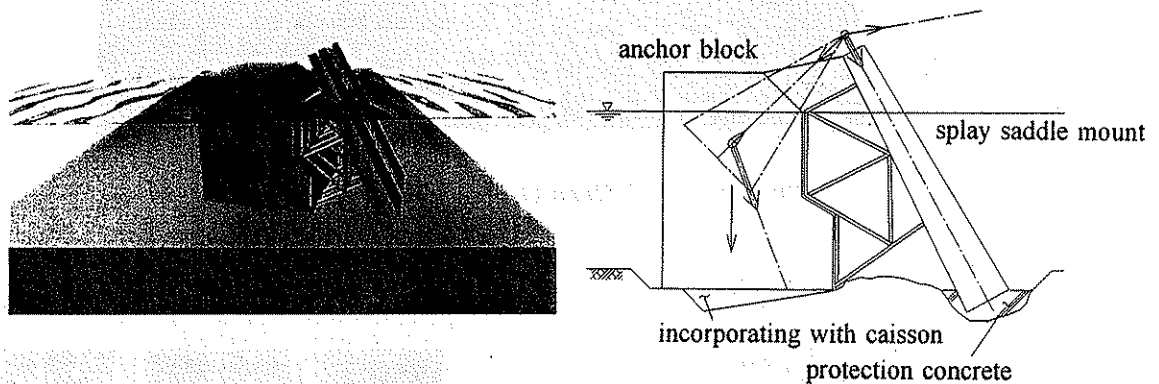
Anchorage Separated of Splay Saddle Mount - Anchor Block
